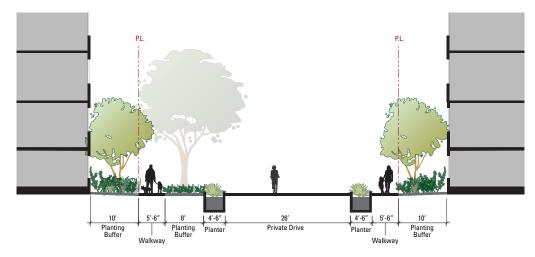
Section H. Garner Drive and Tubman private drive typical section
